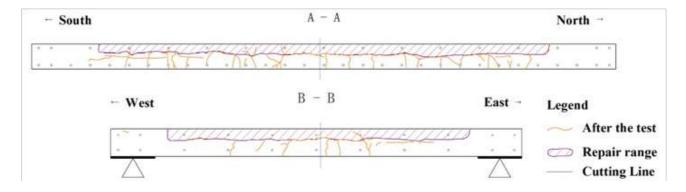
Cutting Surface Deck Specimen, A-A bridge axis direction, B-B bridge axis perpendicular direction
